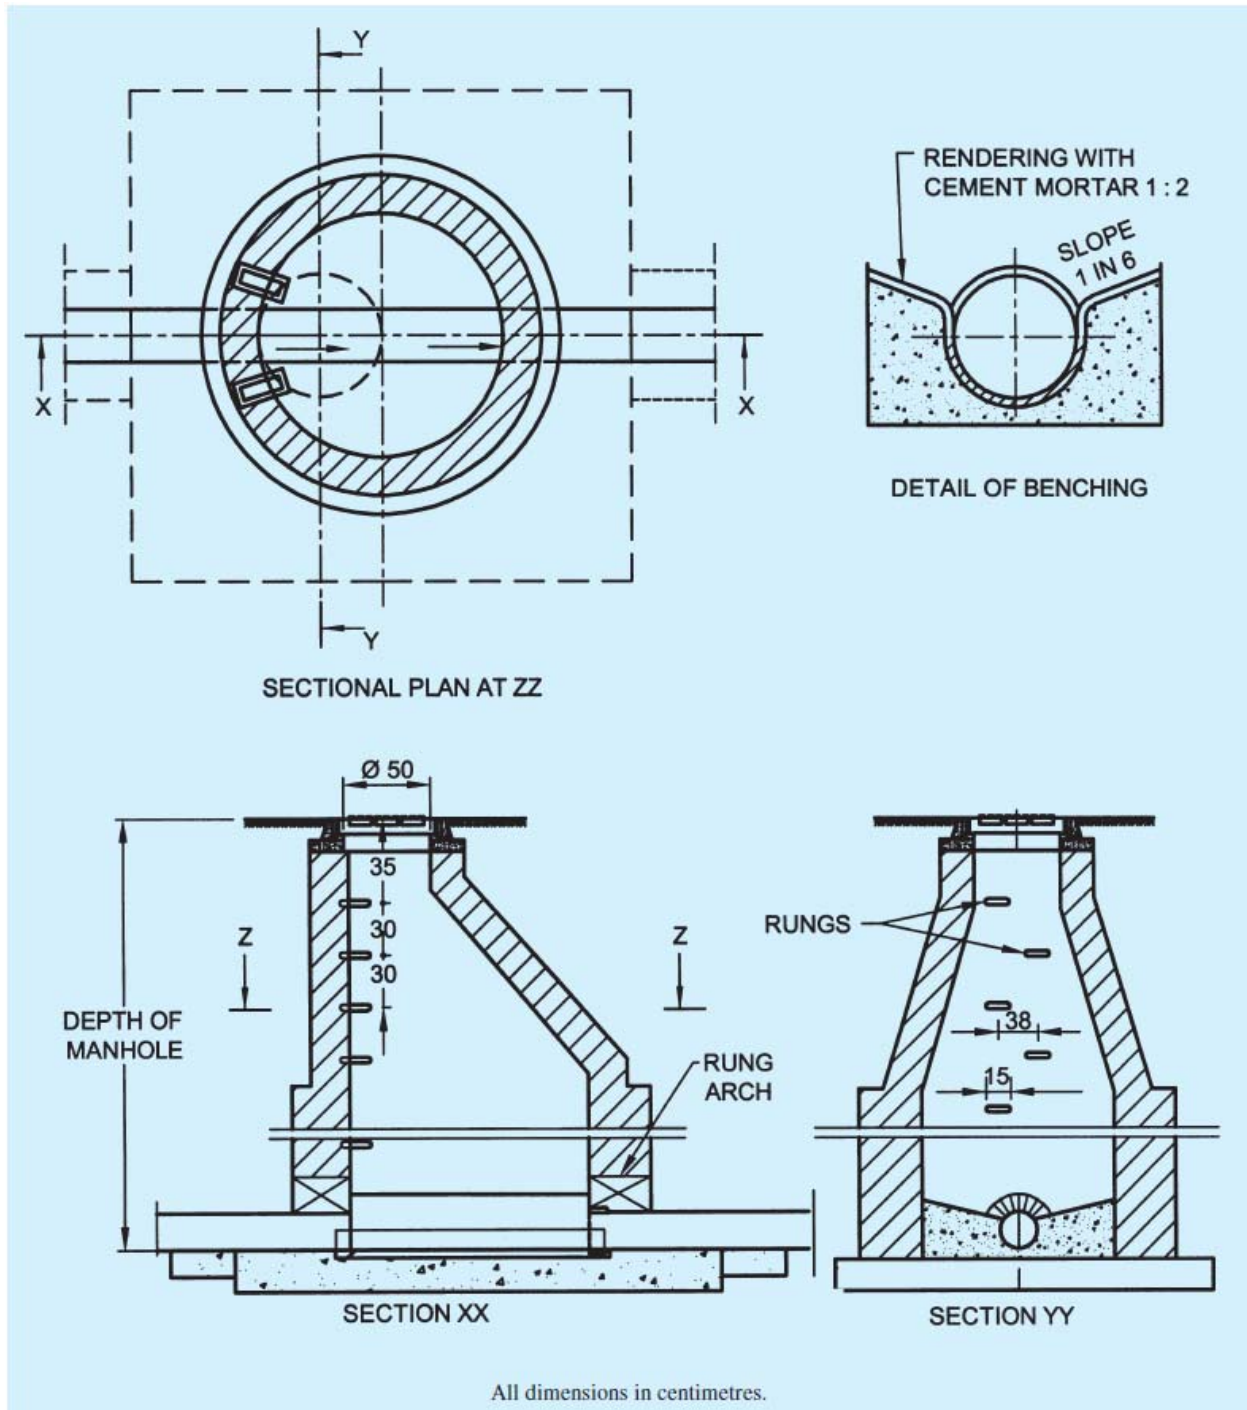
DETAIL OF MANHOLE (DEPTH 2.5 m AND ABOVE)
